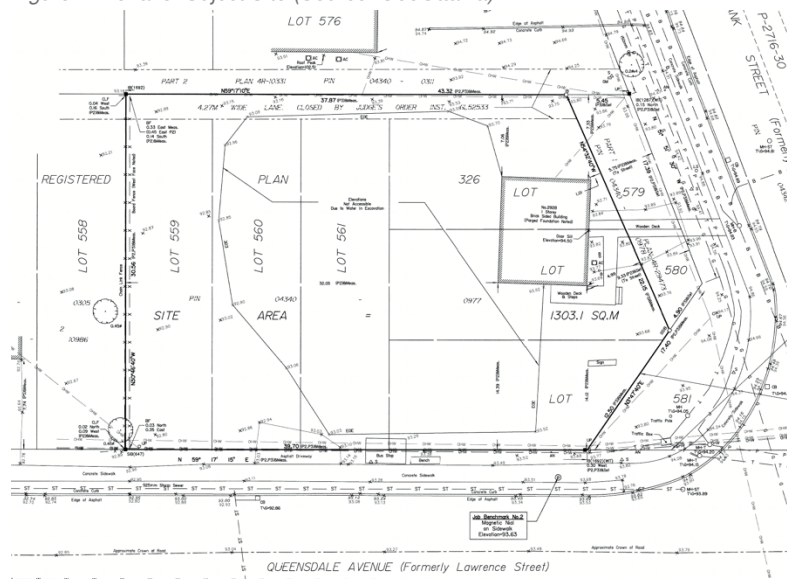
Extract of Site Survey (Source: Annis O'Sullivan Vollebakk Ltd.)
